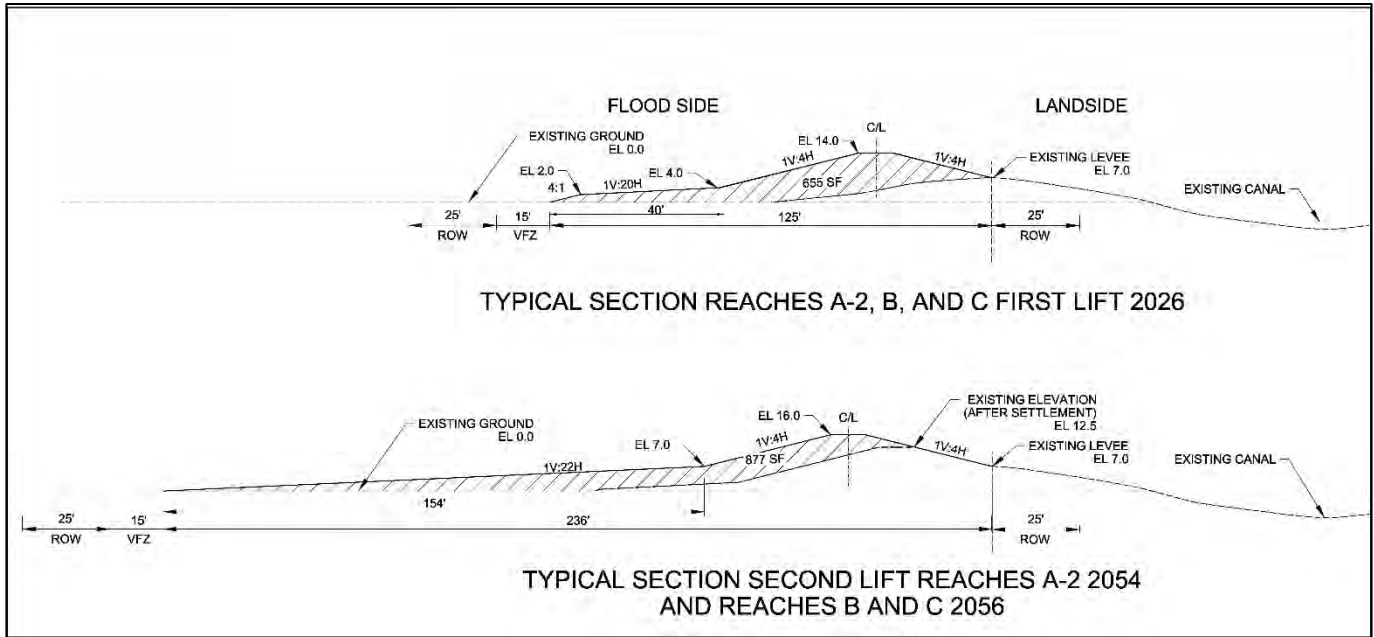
Typical Cross Sections for Hydraulic Subreach A-2 and Hydraulic Reaches B and C
